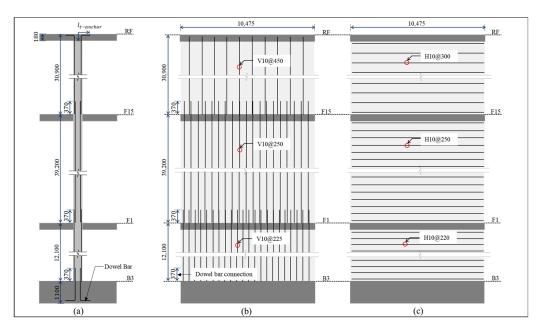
Rebar arrangement of case wall: (a) cross-section of vertical rebar placement; (b) vertical rebar spacing; (c) horizontal rebar spacing (adapted from Kim et al. [45]).
